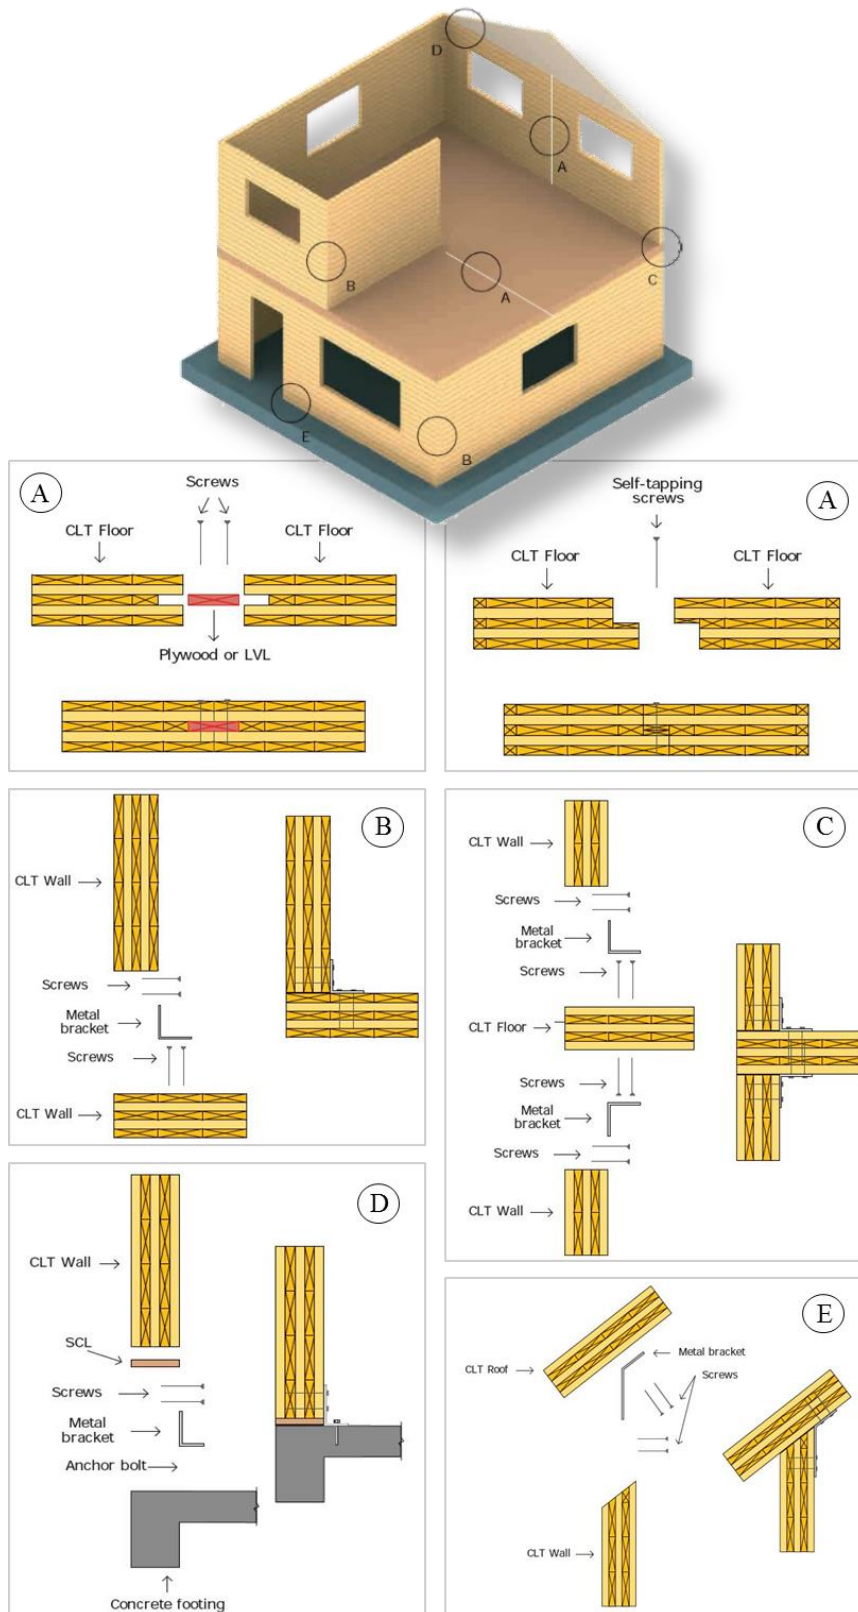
Examples of types of connections typically used to establish panel-to-panel and wall-to-floor connections in CLT construction
